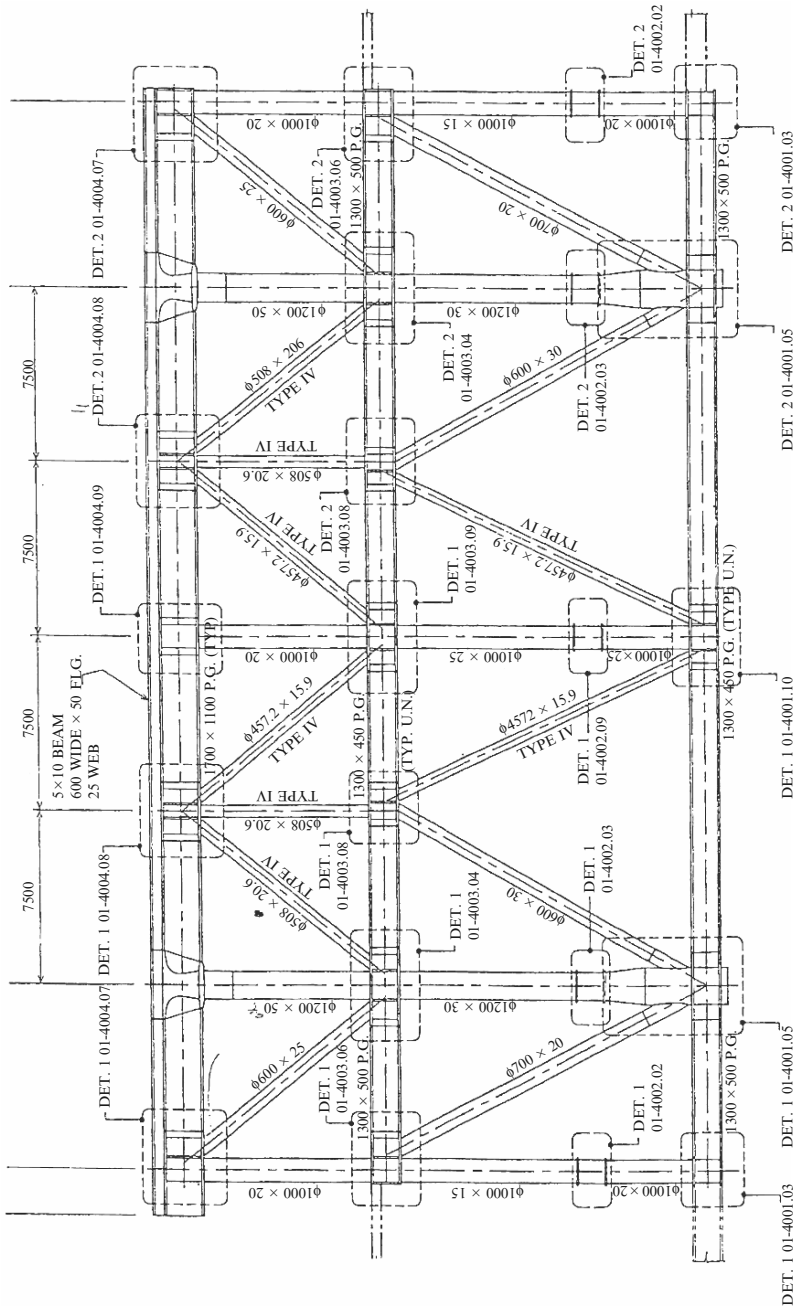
Platform truss elevation (courtesy of AGIP UK)
